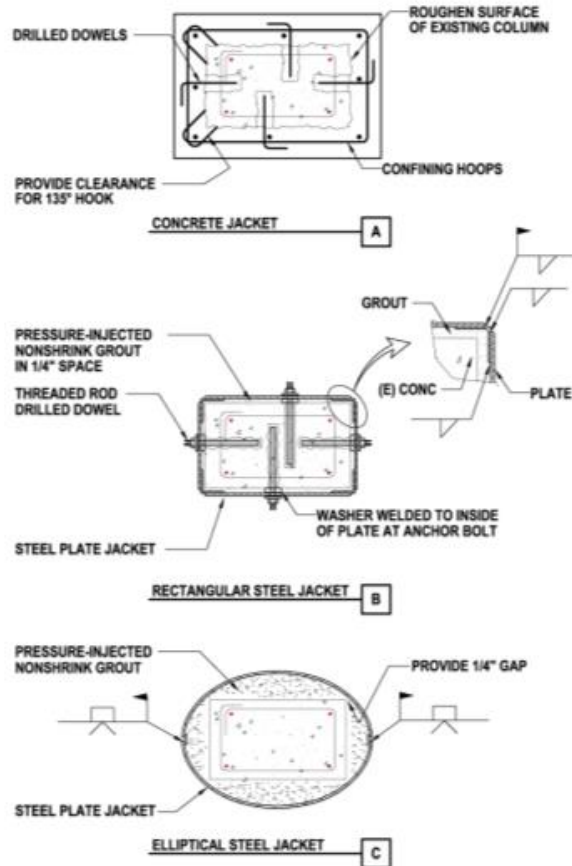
Concrete and steel overlays for concrete columns (FEMA 547, 2006)
